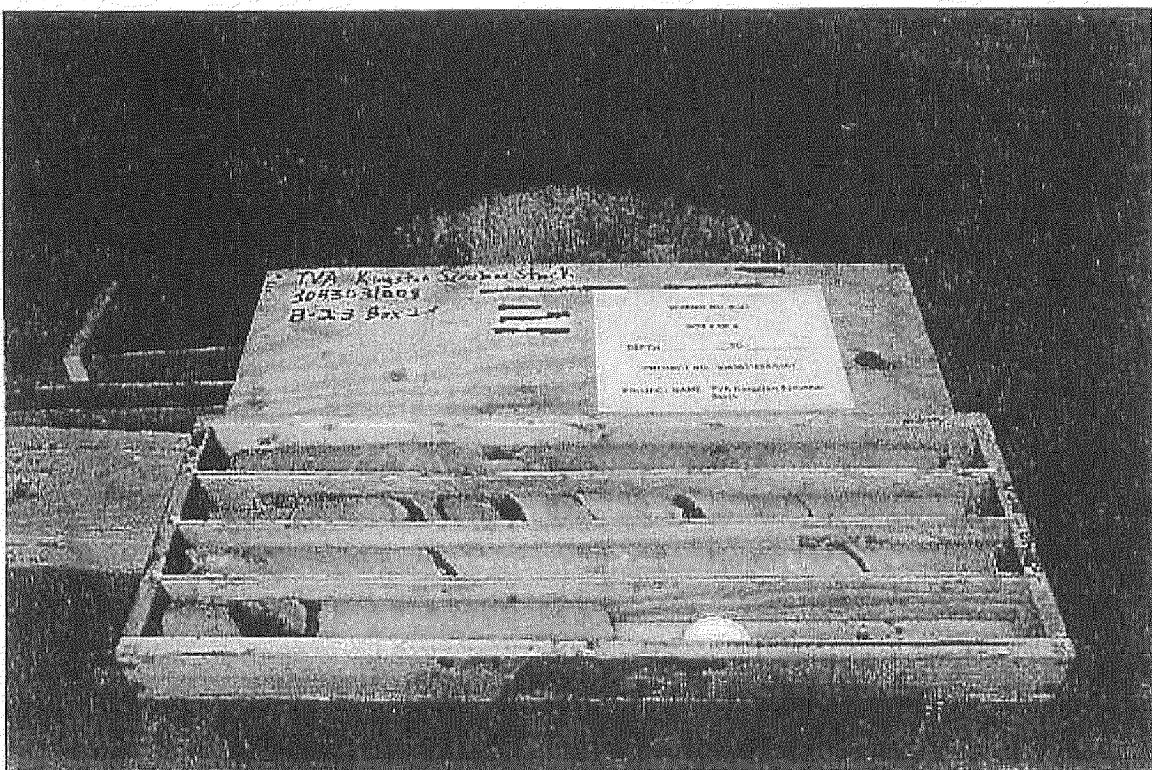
Boring B-22, Box 4 of 4, 64.7 to 68.0 Feet.
